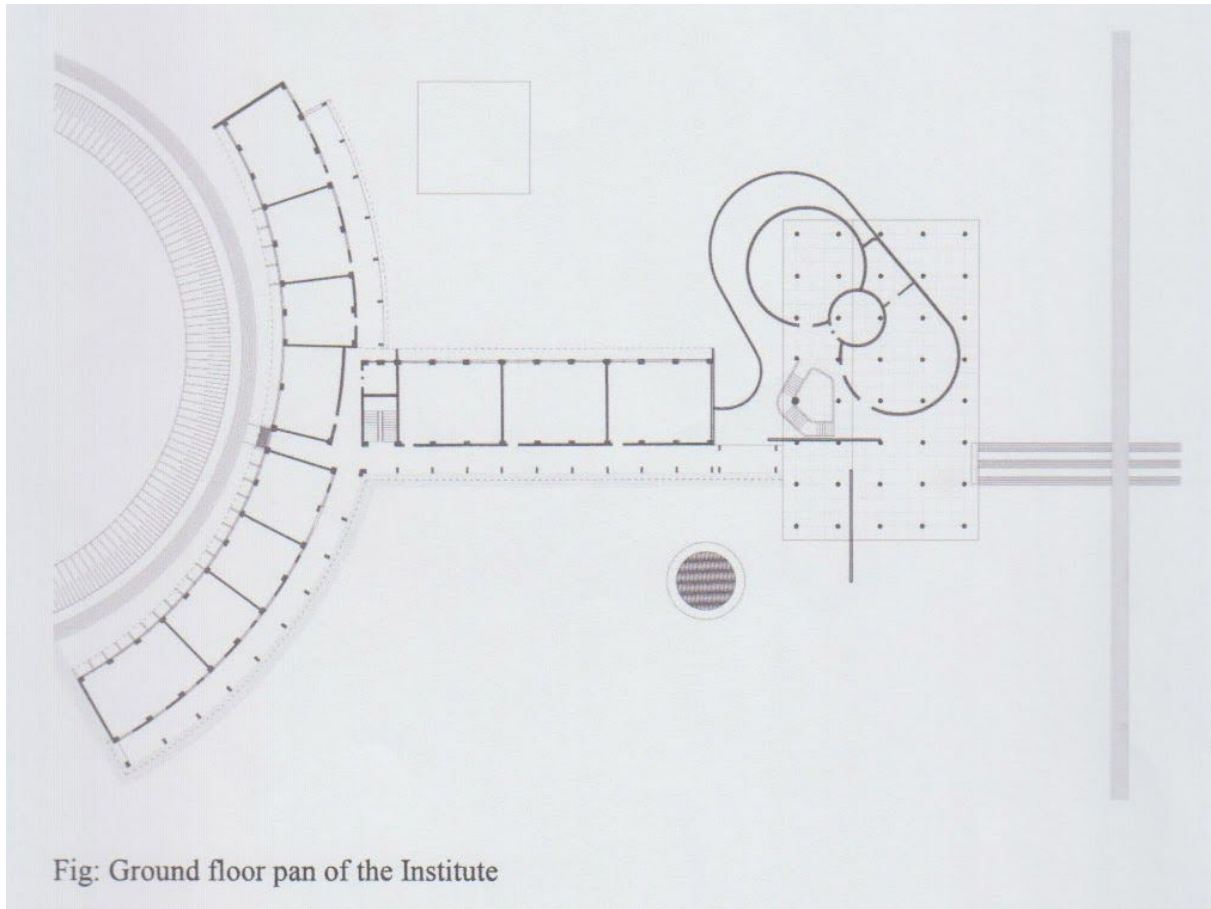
Ground Floor Plan, Fine art inst. Source: Author
